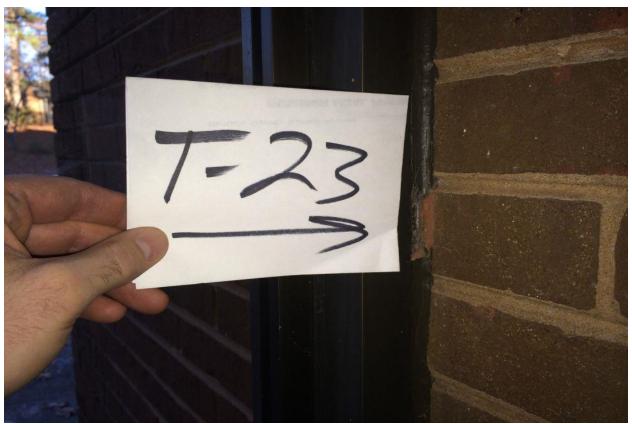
Laboratory analyses did not detect asbestos minerals within the window caulk sample TS-23 collected from the Theatre Building windows.
